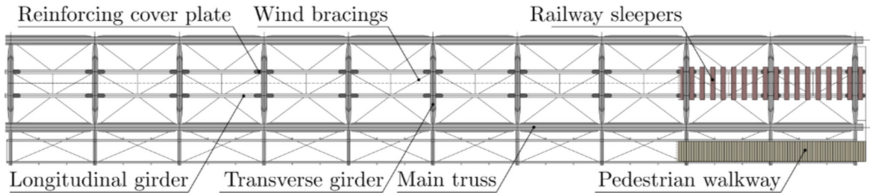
Schematic top view of the bottom structure showing the longitudinal girders, transverse girders and centerlines of wind bracing elements.
